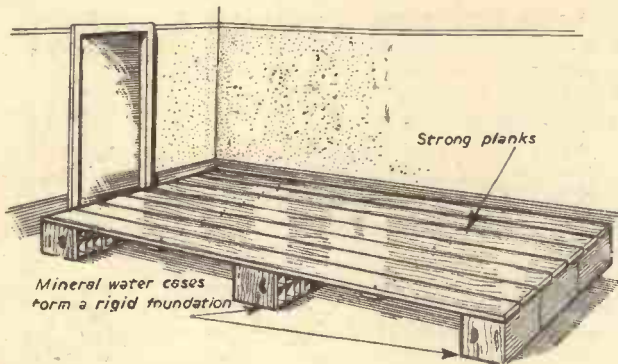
(Left).—A simply-constructed stage made with planks nailed to wooden boxes.
